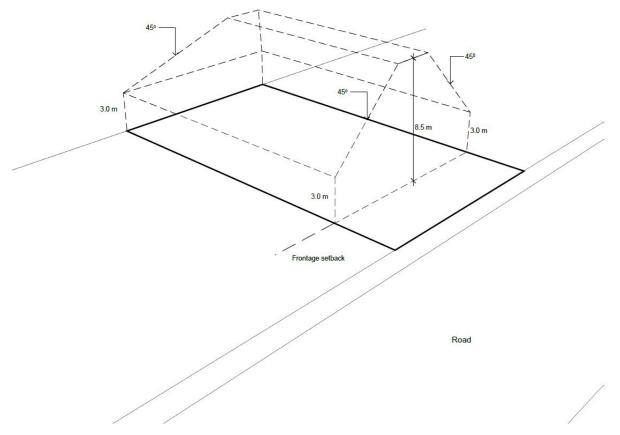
Building envelope as required by clause 10.4.2 A3(a)
